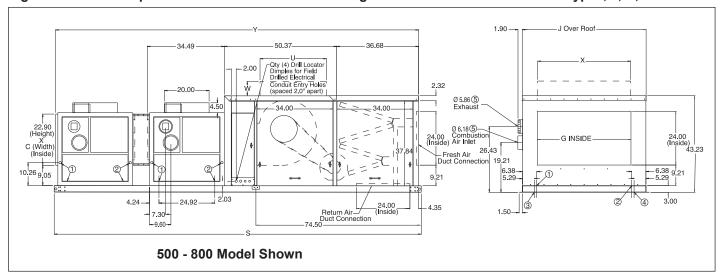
DCS Separated Combustion Cooling Package Unit Dimensions with Blower Type I, J, or K
